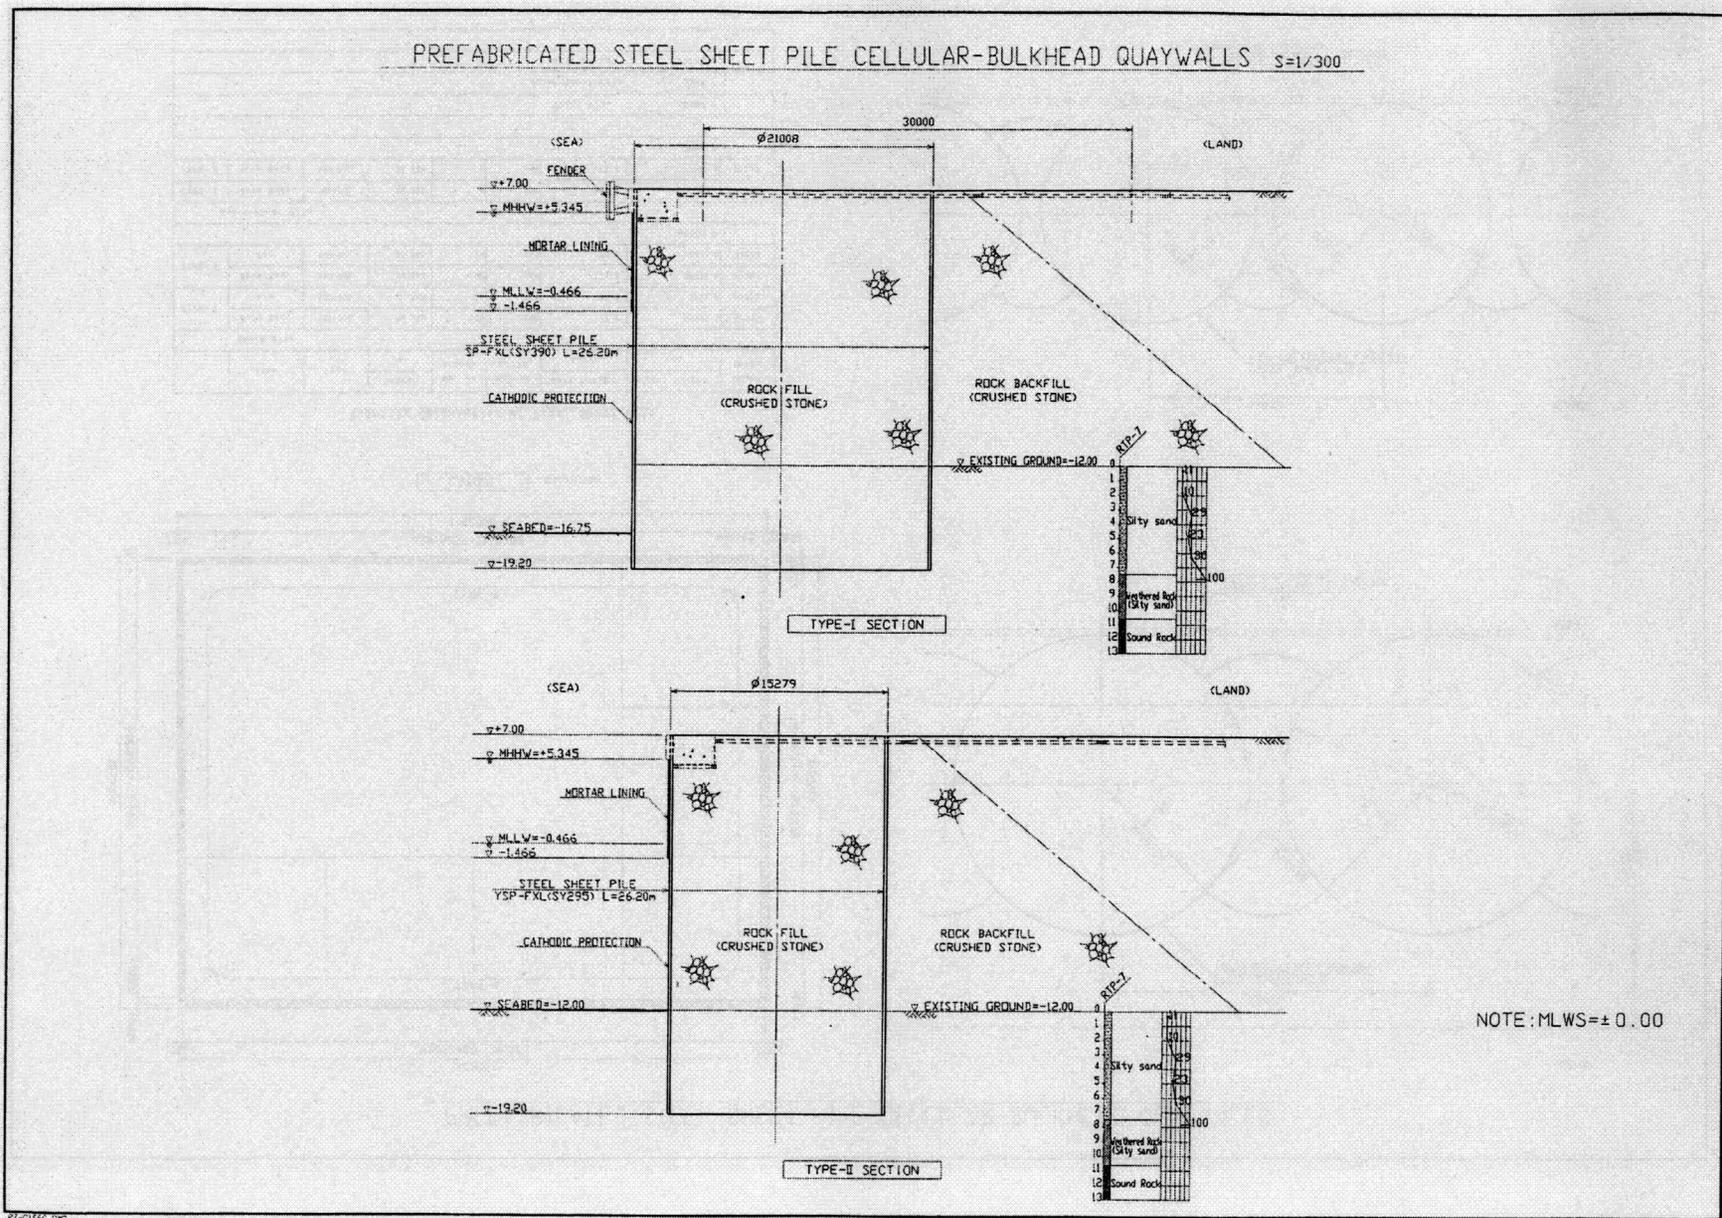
Plan of Steel Sheet Pile Cellular-bulkhead Quaywall in Artificial Island
